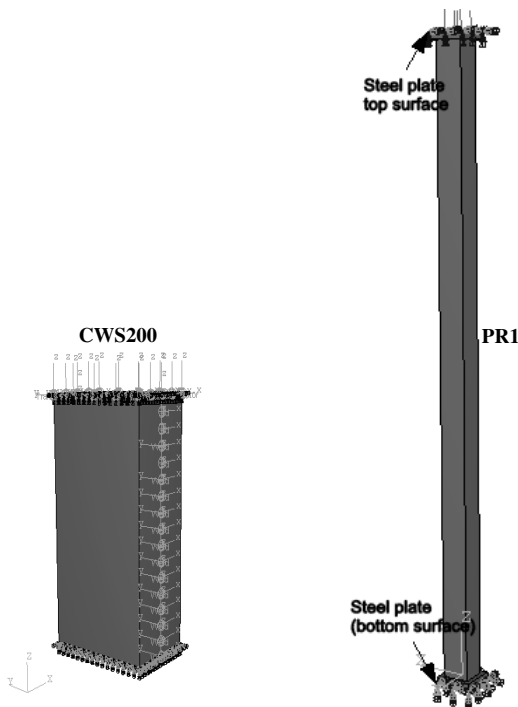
Boundary conditions and load application, example of columns CWS200 and PR1.
